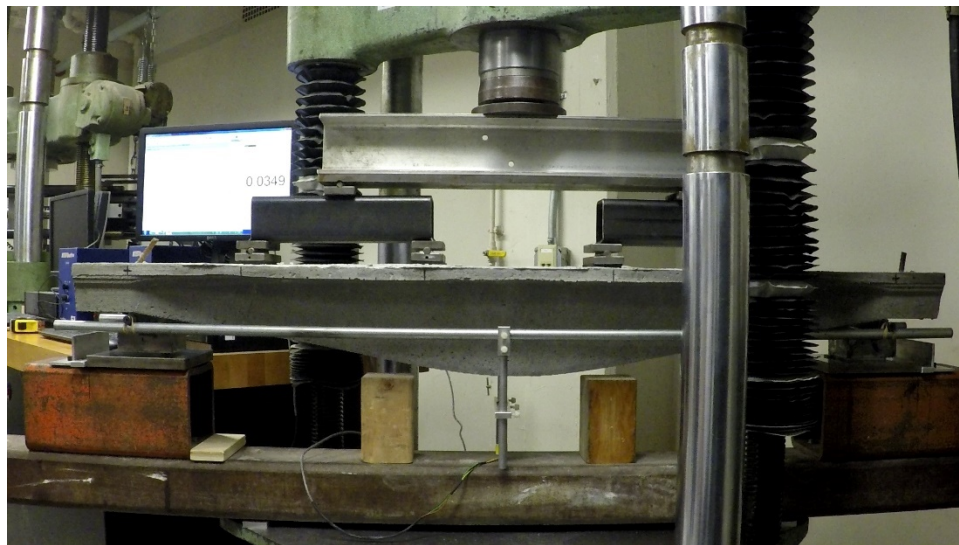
Fixture for load testing slabs, LVDT is mounted below beam for deflection measurements
